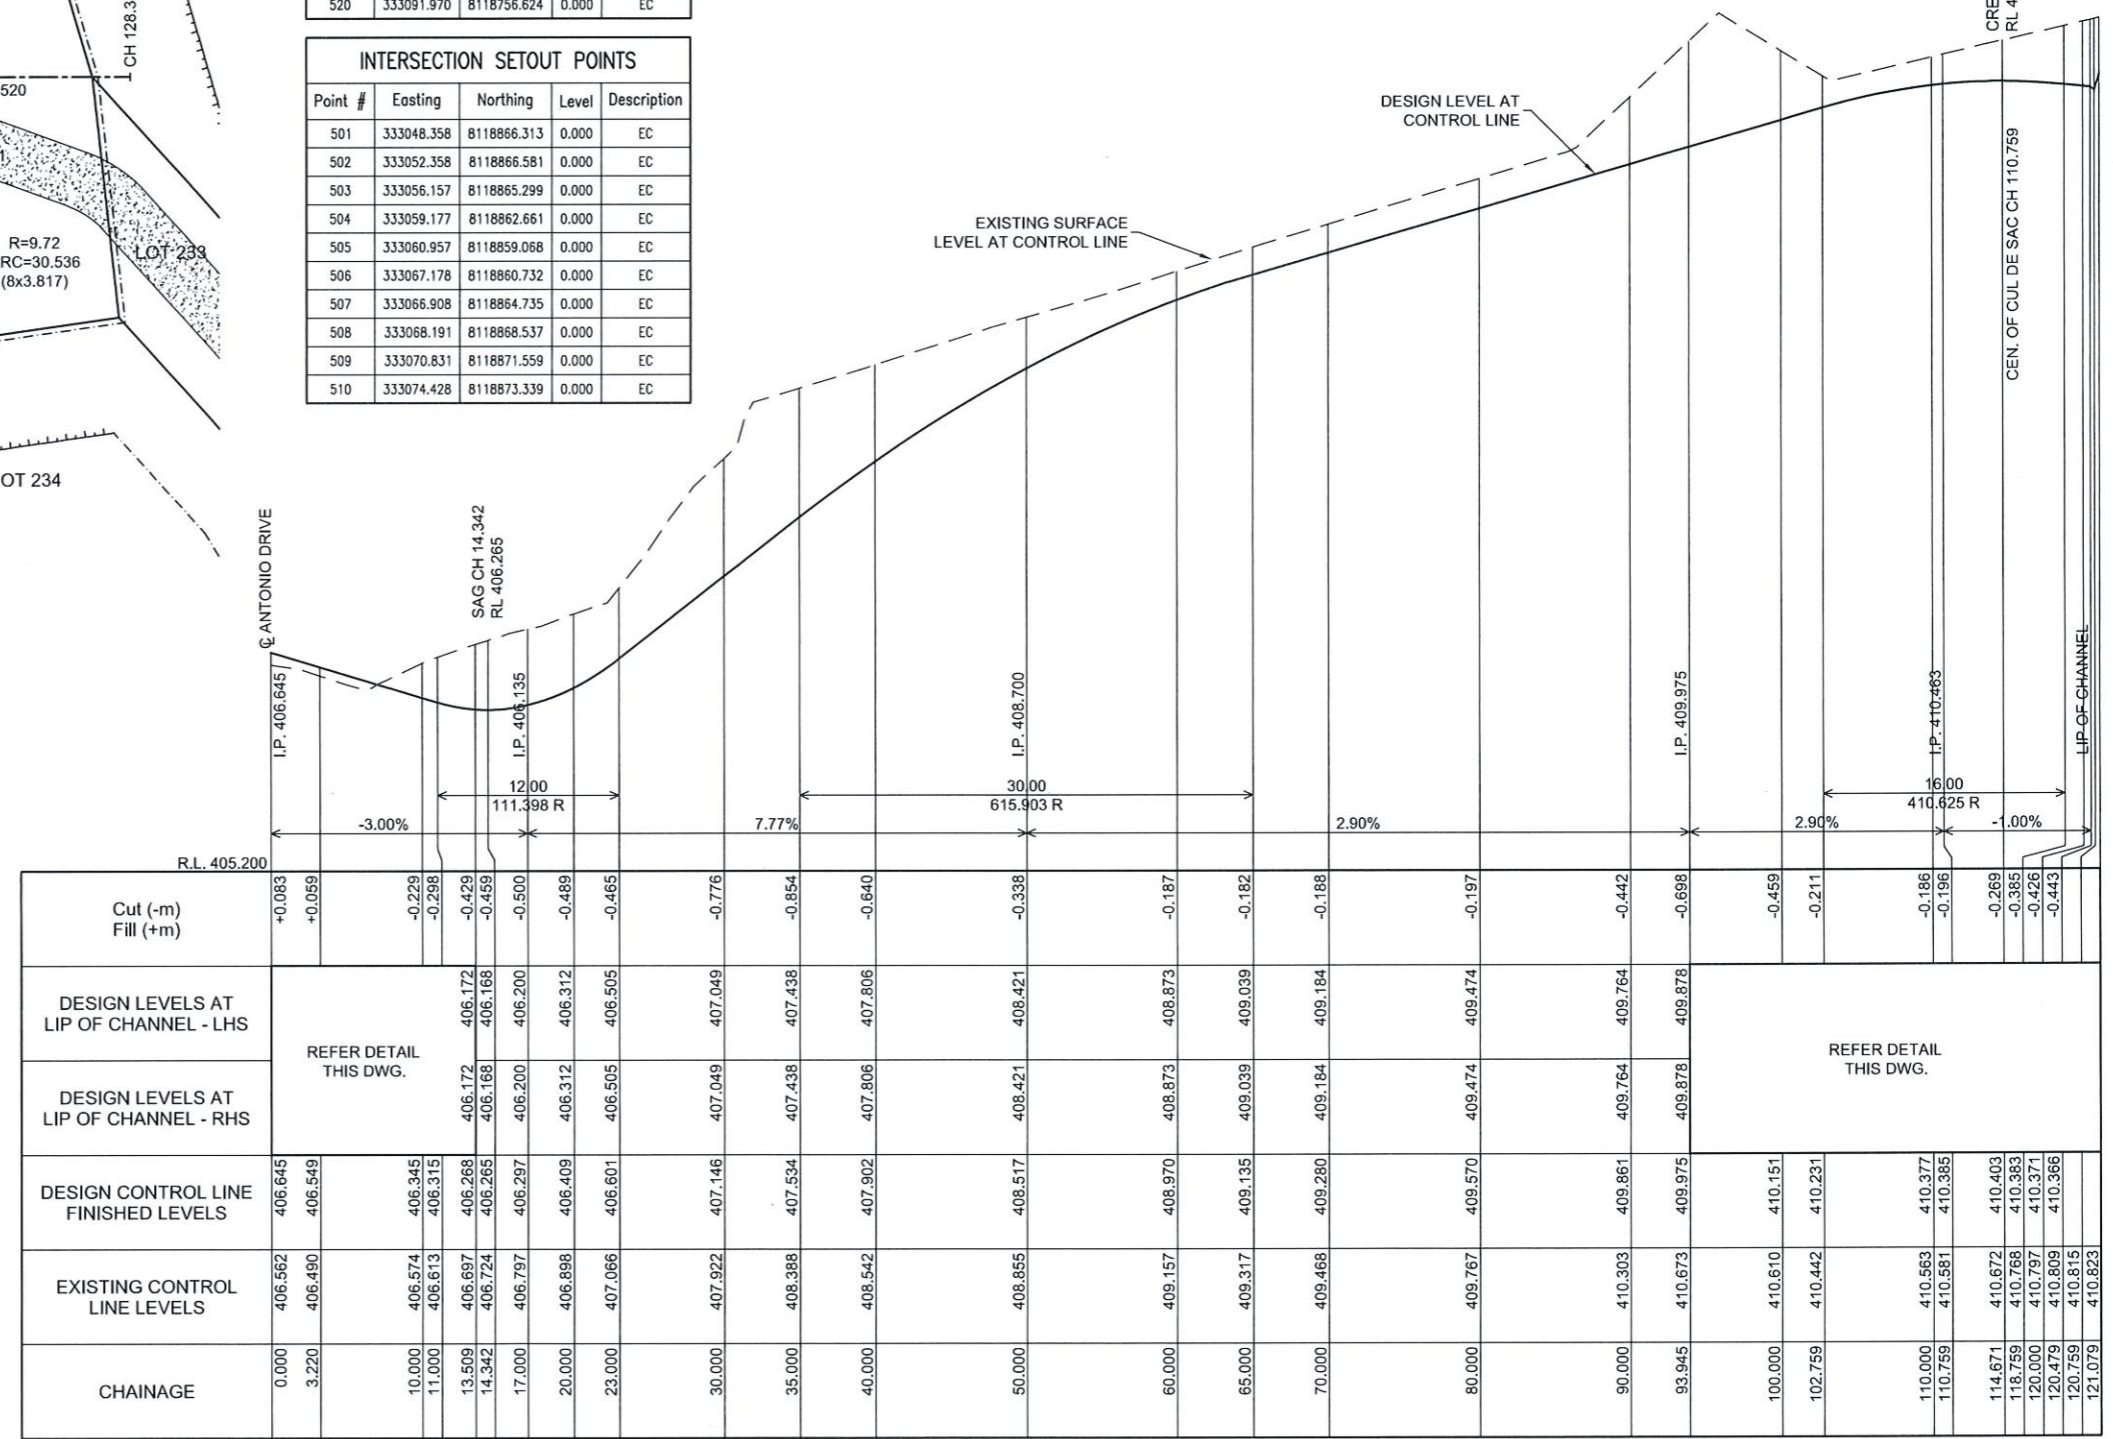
DETAIL OF ANTONIO DRIVE - ROAD D INTERSECTION
